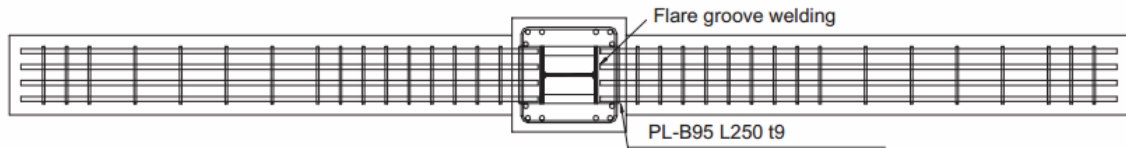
Details of concrete-encased CFST column to RC beam joints (unit: mm) (Liao et al., 2014)
